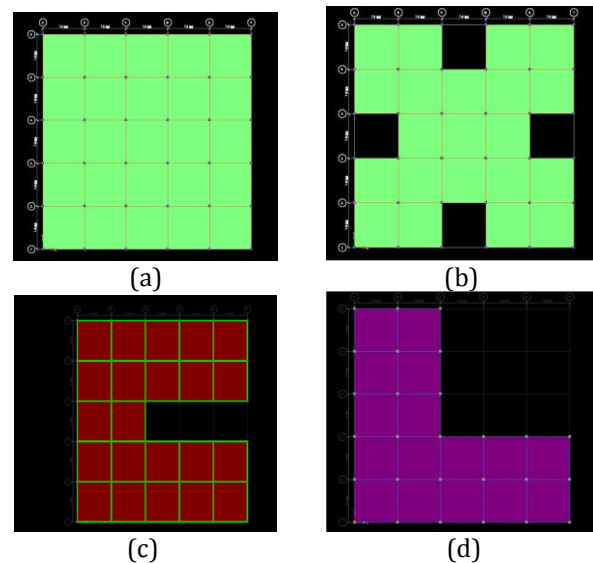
Plan (a) Rectangular shaped (b) H-shaped (c) C- shaped (d) L-shaped of the building.
